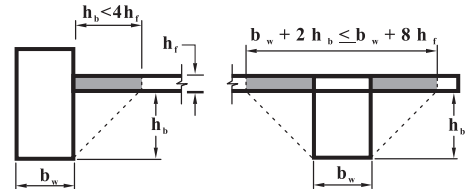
Examples of the portion of slab to be included with the beam for torsional design.
